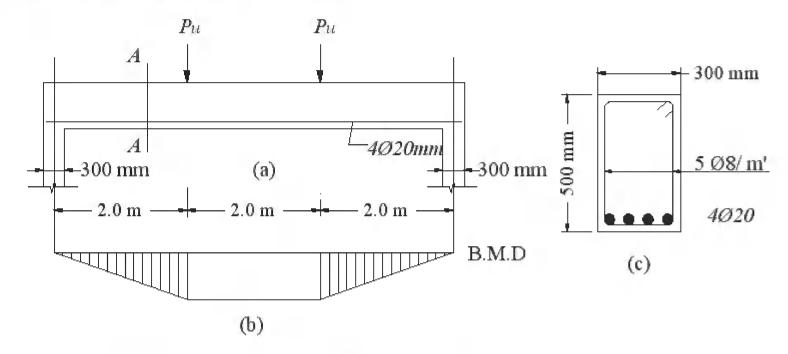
(a) Beam and loads; (b) Bending Moment Diagram; (c) Section A-A
